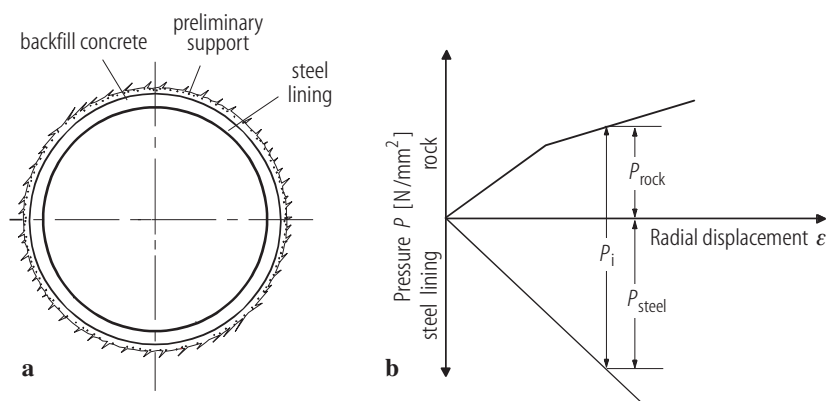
(a) Typical cross section with steel lining. (b) Schematic stress-strain diagram for the compound system rock-steel (with P_i the internal pressure).
